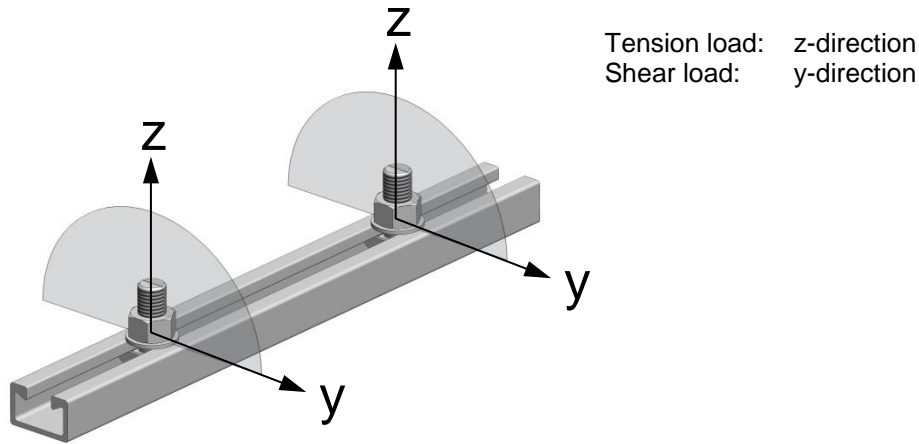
Example of a hot-rolled mounting channels with corresponding channel bolt
